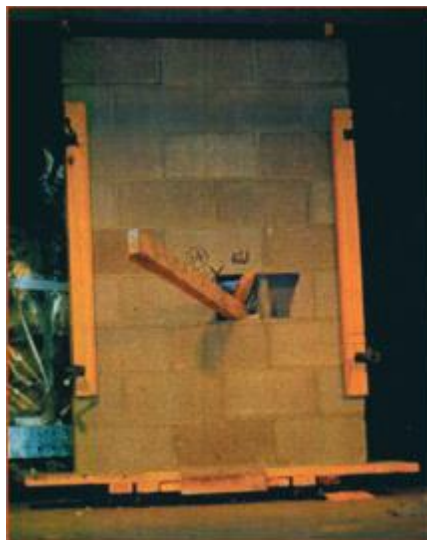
2 x 4 Wood Stud Launched at 100 mph Pierces Un-reinforced Masonry Wall [3].
